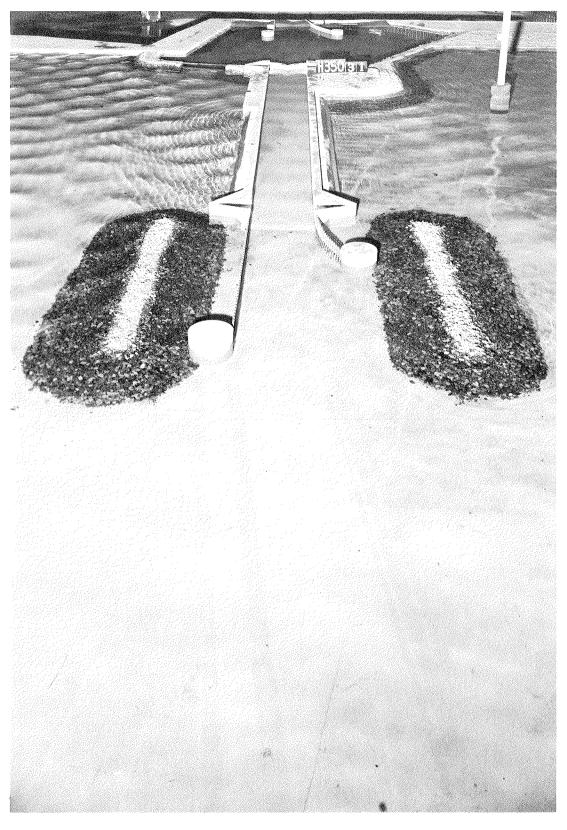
Typical wave patterns at lock entrance for Plan 8; 4-sec, 4-ft waves from NNW; swl = +1 ft msl
